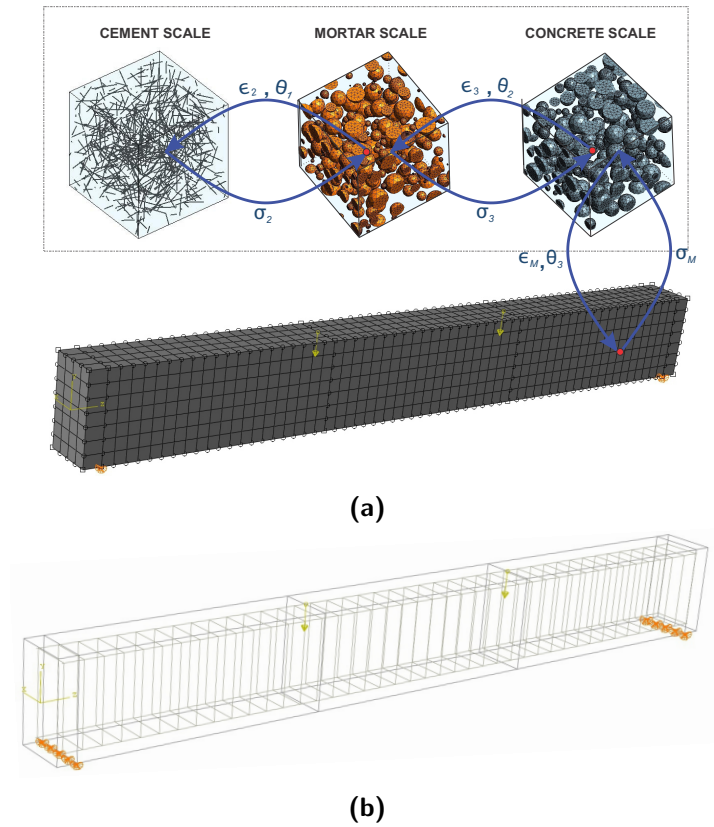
(a) CNT-reinforced concrete multiscale model (b) geometric configuration of concrete beam with rebar and stirrup reinforcement
